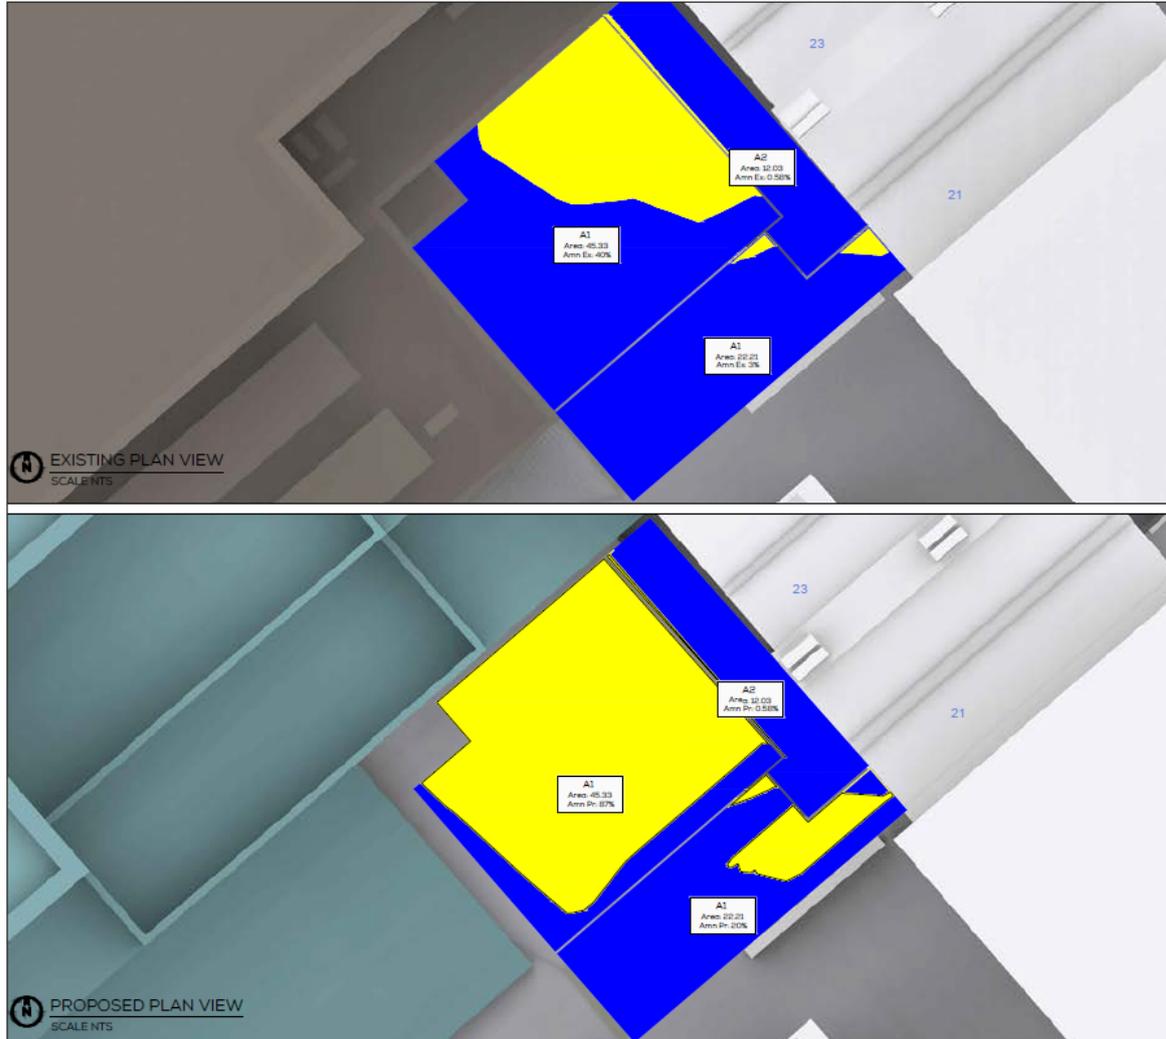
Existing vs Proposed ‘sunlight on ground’ to neighbouring properties on Yardley Street.
